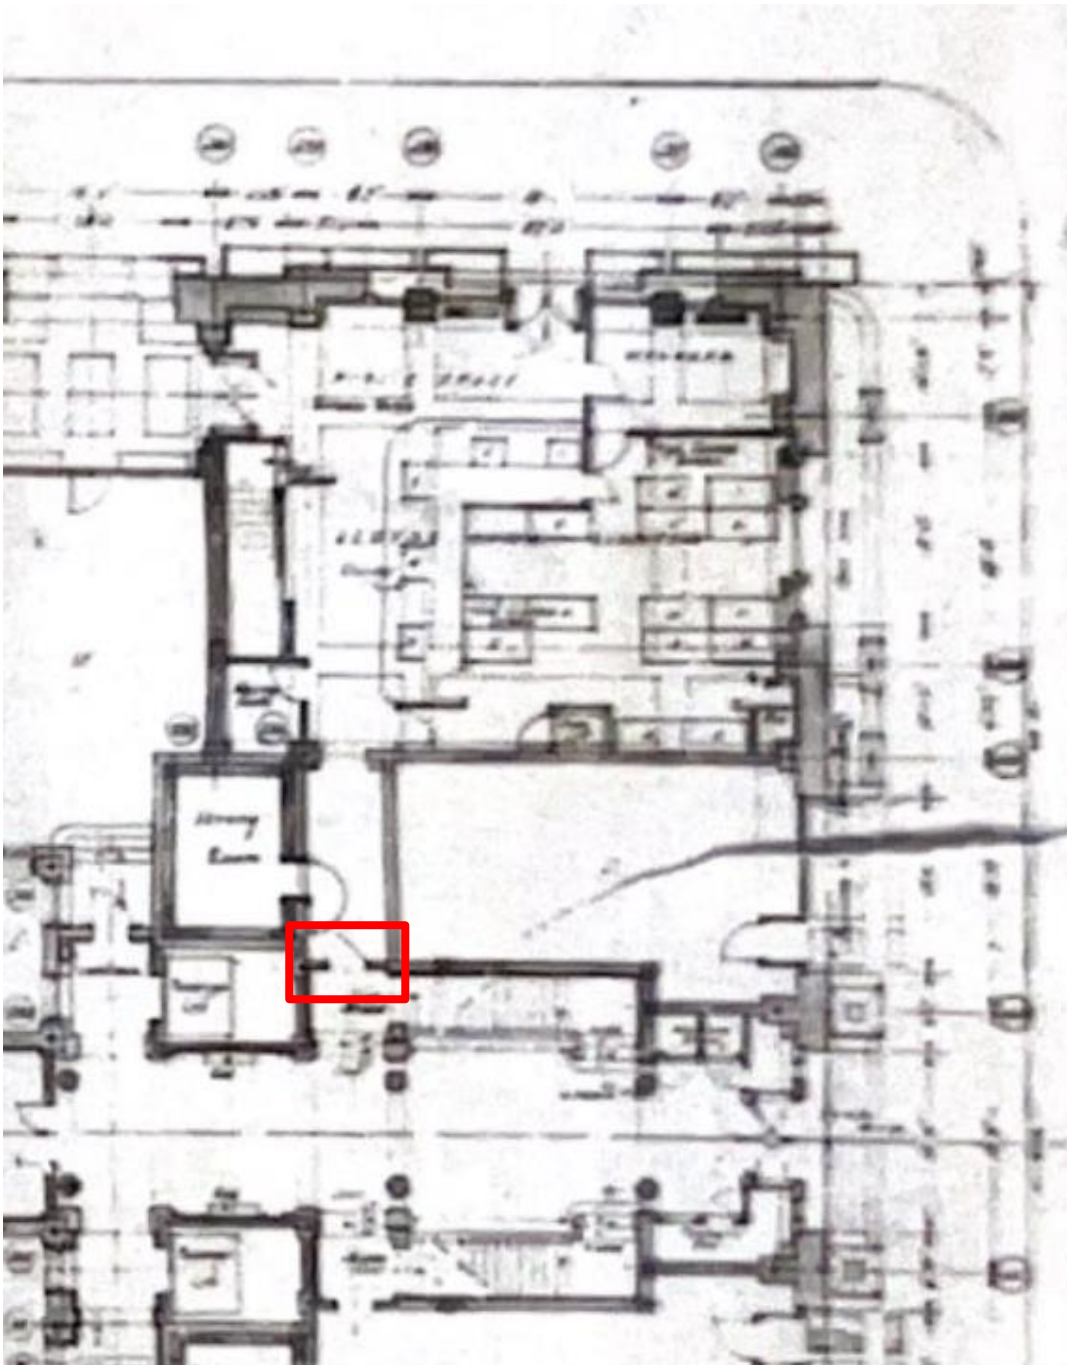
Victoria House Plans, c.1920s (source: Camden Archive)
